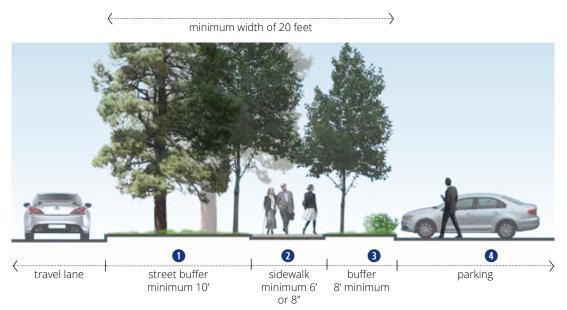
Secondary Street Frontage - Parking Edge
